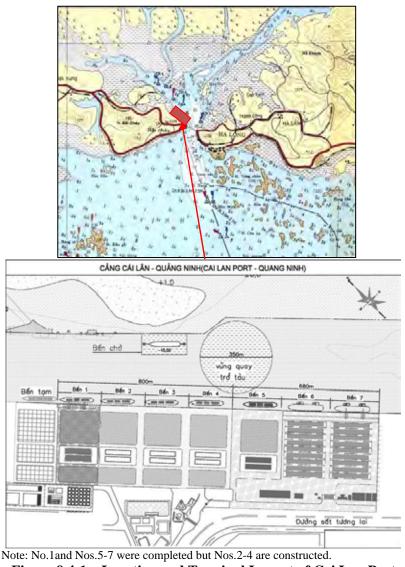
Location and Terminal Layout of Cai Lan Port
